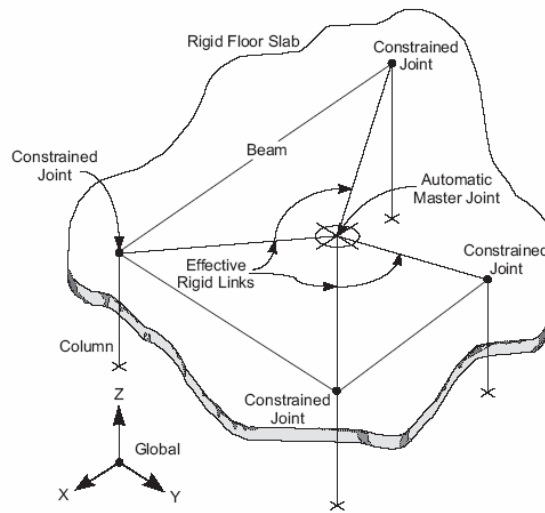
Use of the Diaphragm Constraint to Model a Rigid Floor Slab (SAP2000 manual [9])
